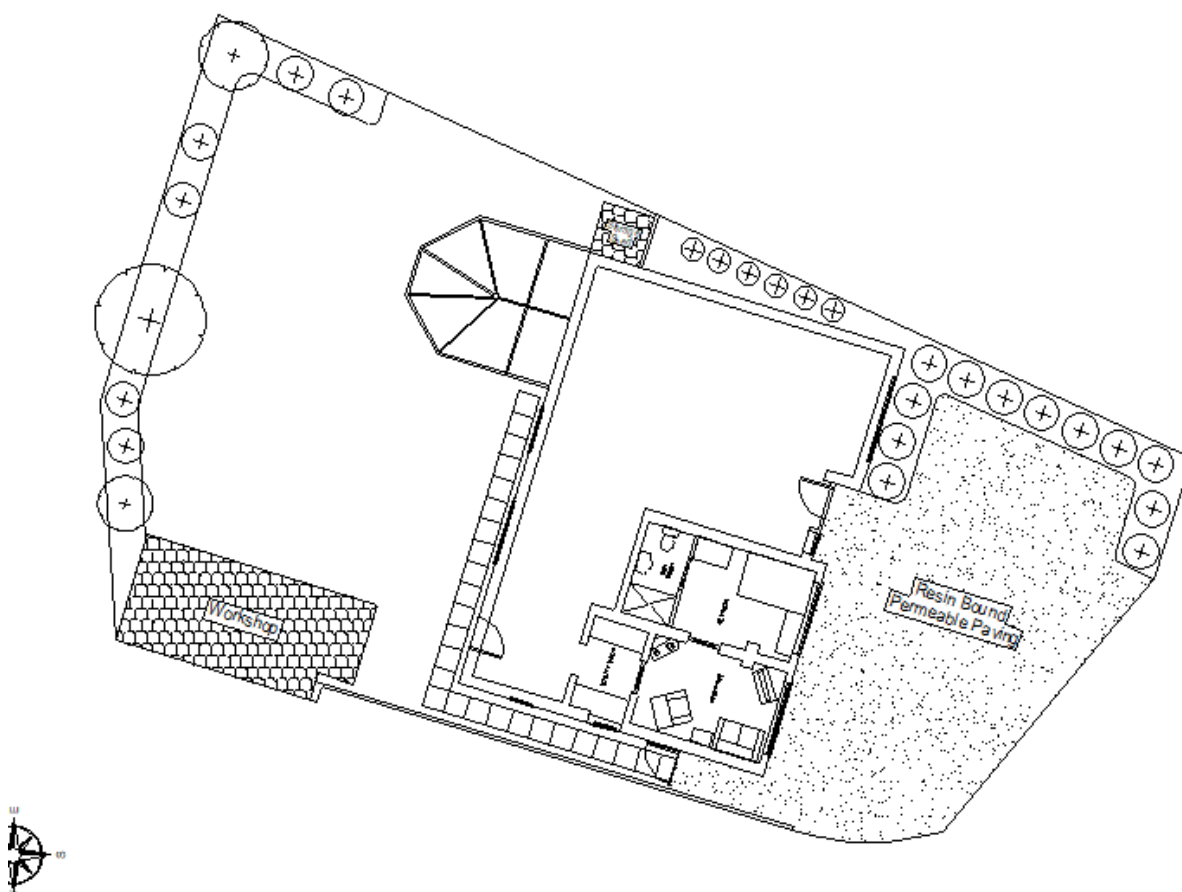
Site plan showing the siting of the workshop, shed, and parking area and floorplans of the garage conversion.
